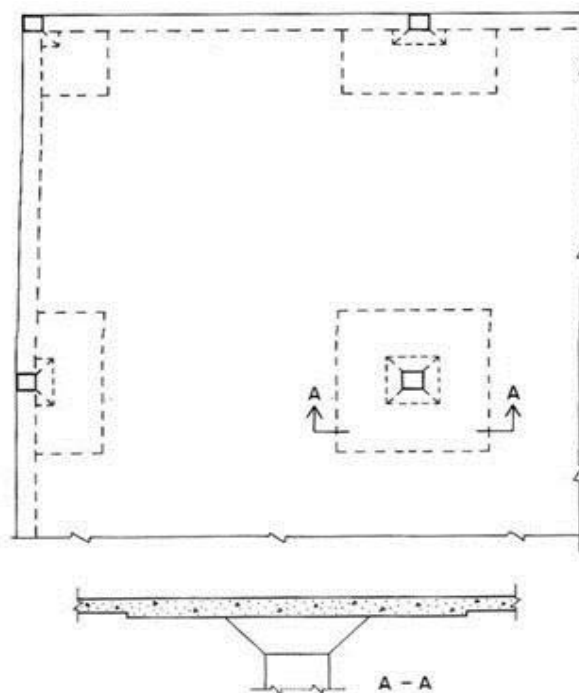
Concrete flat slab construction with drop panels and column caps
